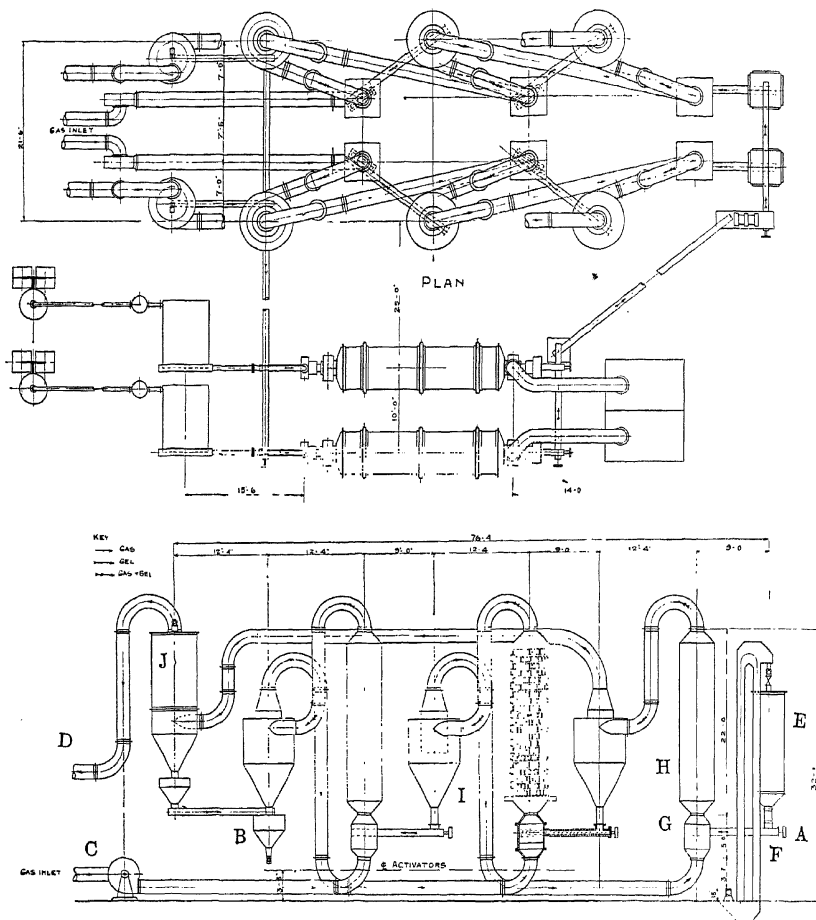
Silica Gel Adsorption Plant, Plan and Elevation.
